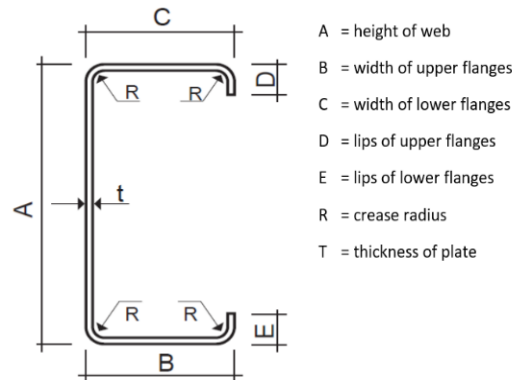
The geometry and cross-sectional dimensions "C" Profile of the SNI-1729:2015 [1].
